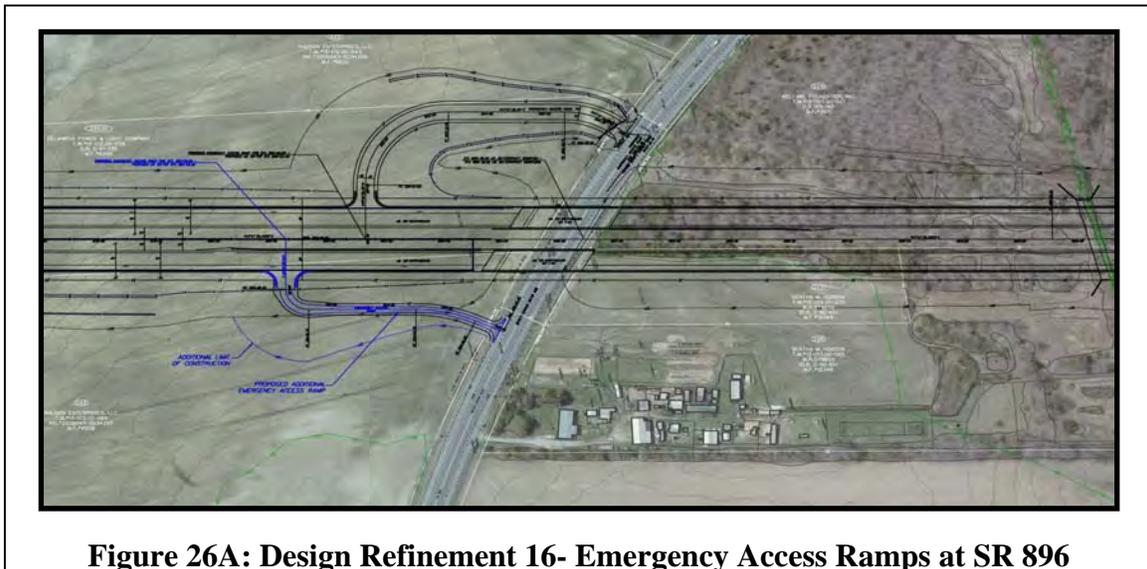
A: Design Refinement 16- Emergency Access Ramps at SR 896
